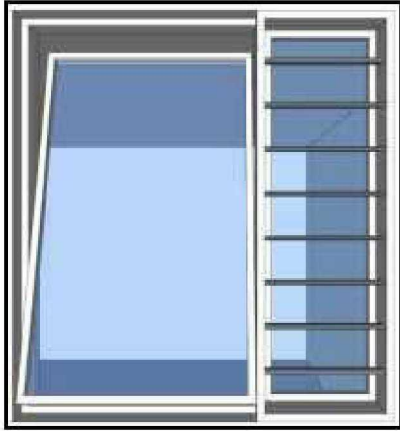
Elevation of Pivot Window and Purge Ventilation Window
